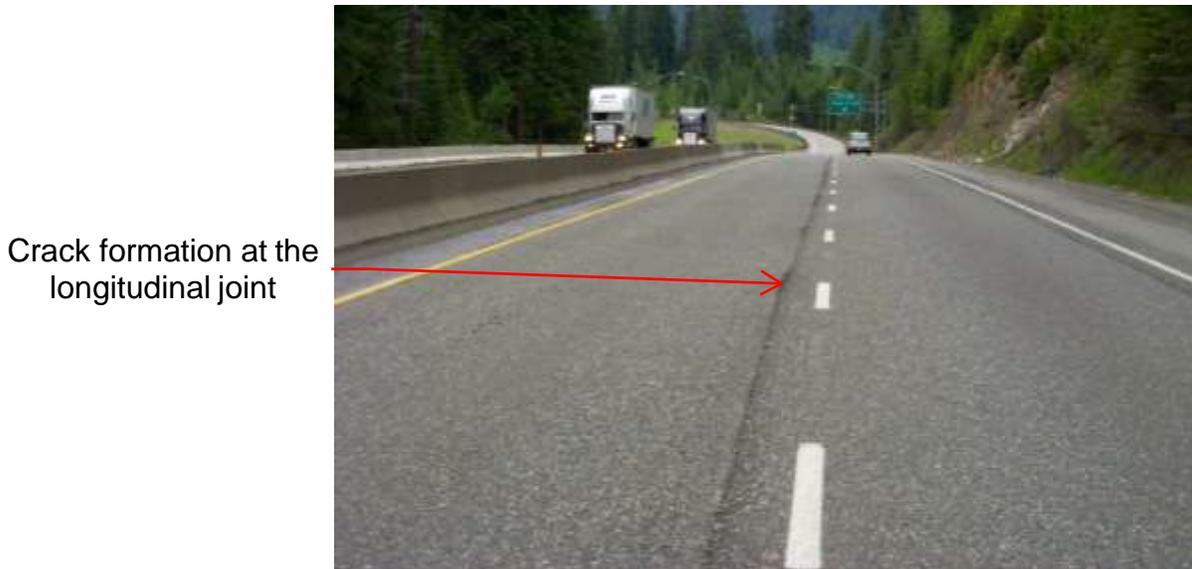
Moderate longitudinal joint crack. (Pavement Interactive)
